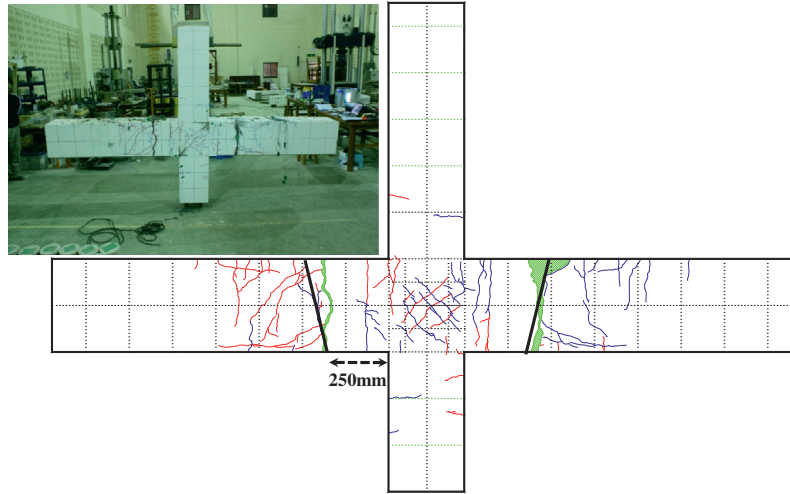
Crack Patterns at Failure of PC-OH-25 Specimen.
